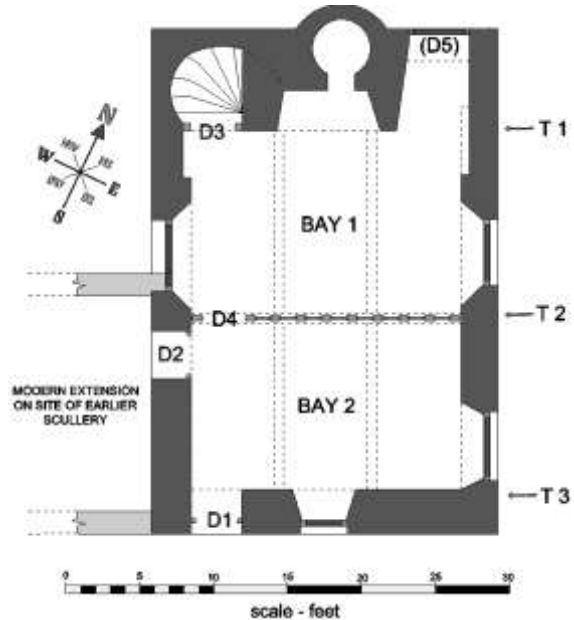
(right). Old House Farm, Bredwardine. The ground plan
